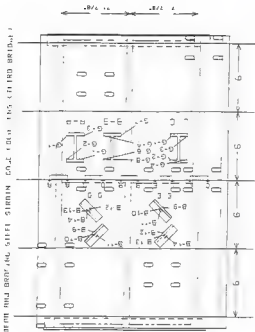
Reinforcement Steel Strain Gage Locations (Second Bridge)
